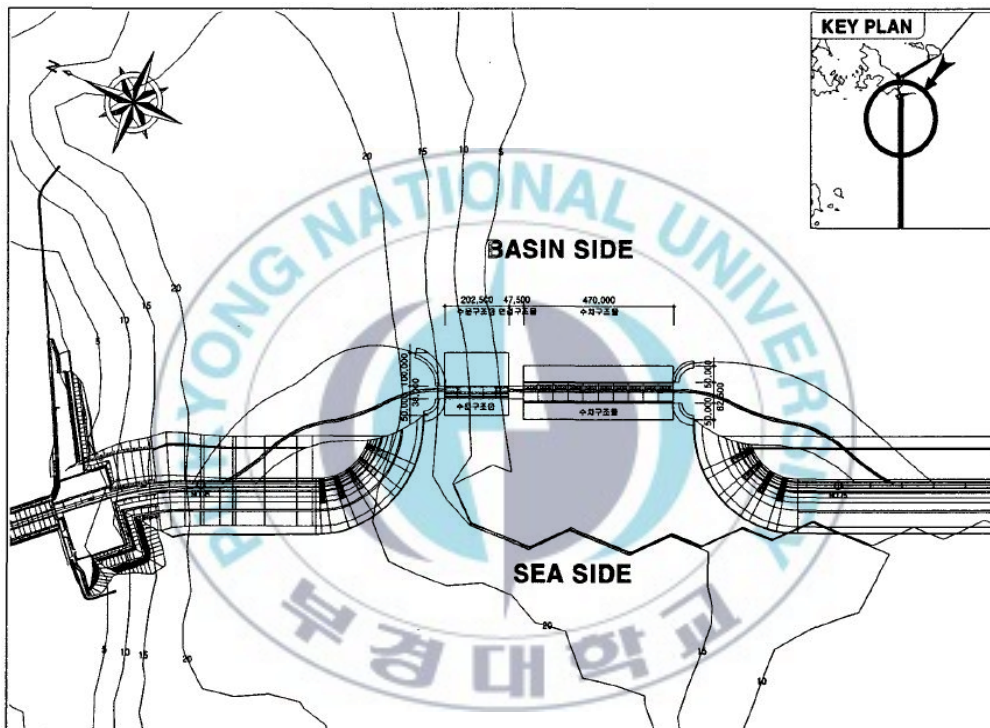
Saemangeun tidal power plant structural layout plan (MKE, 2006).
